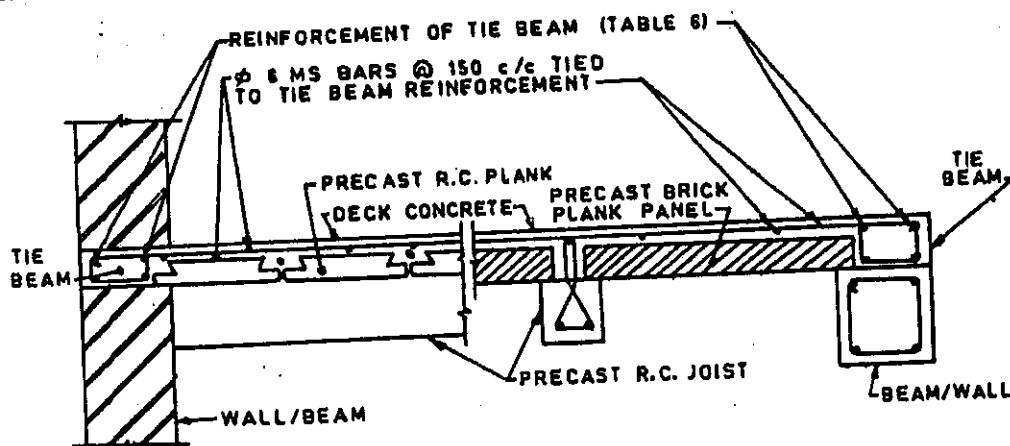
CONNECTION OF PRECAST REINFORCED CONCRETE PLANK AND PRECAST BRICK PANEL FLOOR/ROOF (WITH DECK CONCRETE) WITH TIE BEAM
